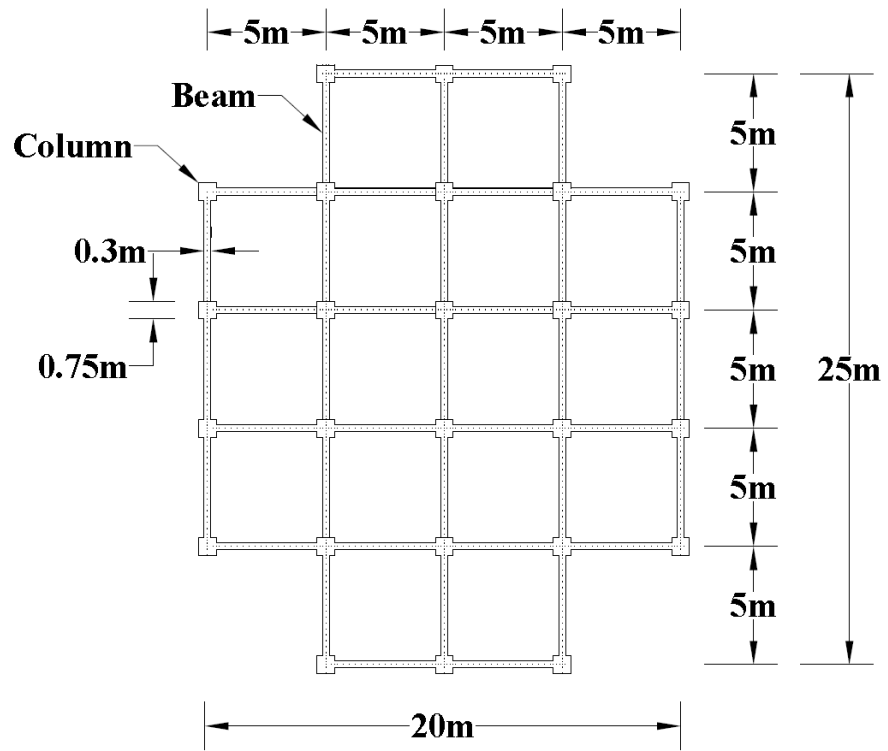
Ground floor plan of Plus Shape-1 building
